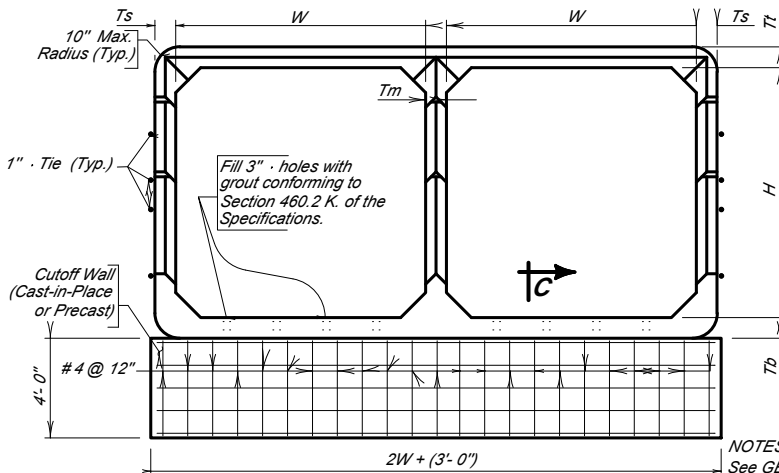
CULVERT-PRECAST DOUBEL BOX WITH SLOPED END-4' CUTOFF WALL
